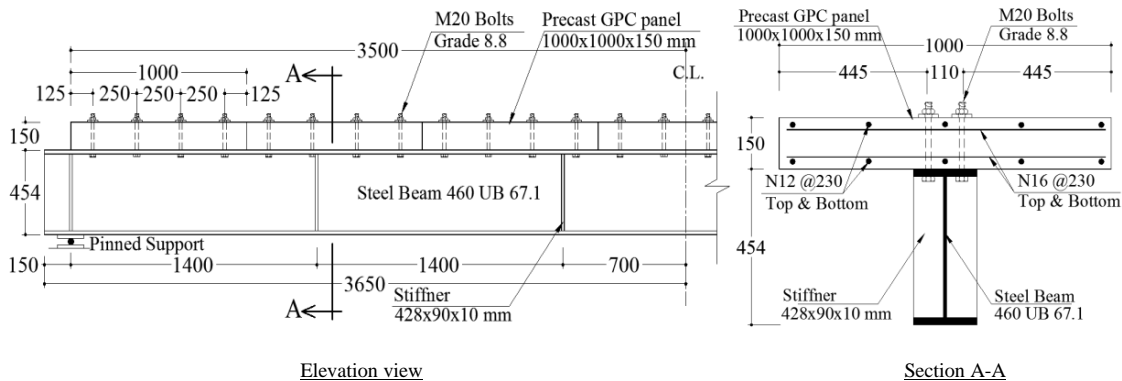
Geometry and details of composite beam CB2 (unit: mm).
